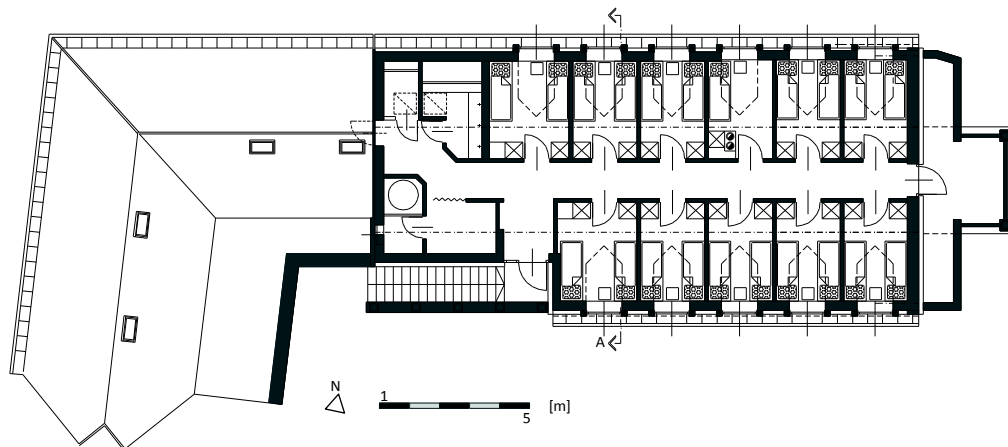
Floor plan first floor of NAT (based on H. Deubner).
